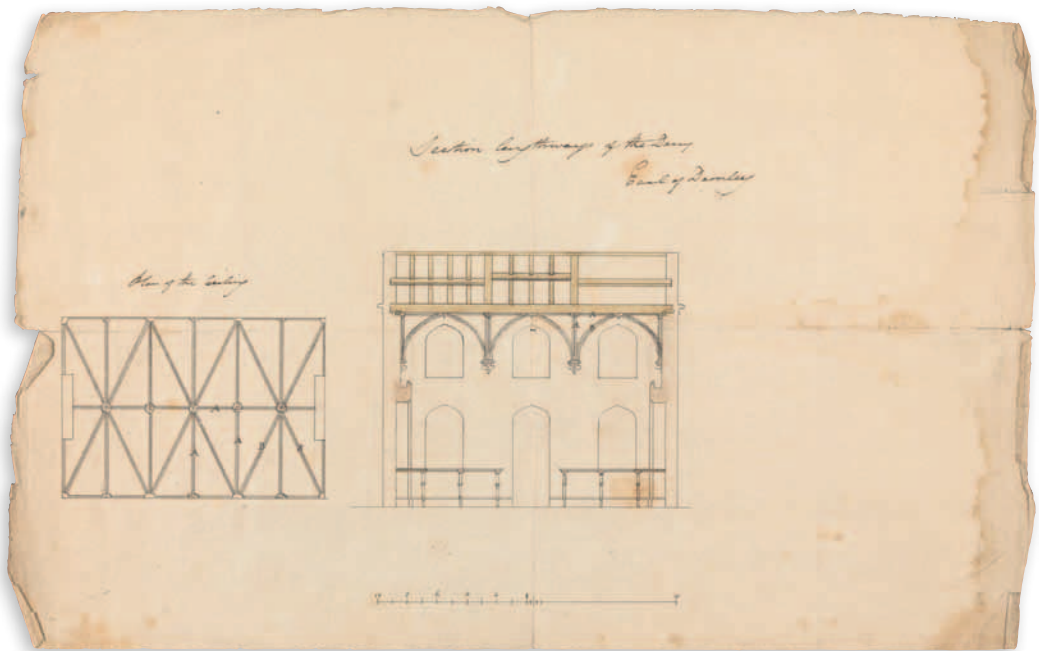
Longitudinal section with layout for the ceiling of the central chamber. Note too the marble shelves. (Yale Center for British Art, Paul Mellon Collection, B1977.14.796)
